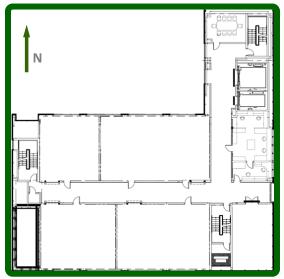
Courtesy of Project Engineer. Layout of the building footprint. The building is 122 feet by 122 5 feet
